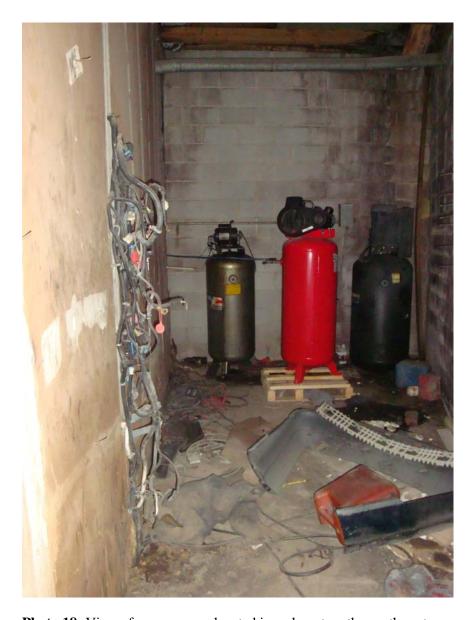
View of compressors located in a closest on the southwest corner of the building.
